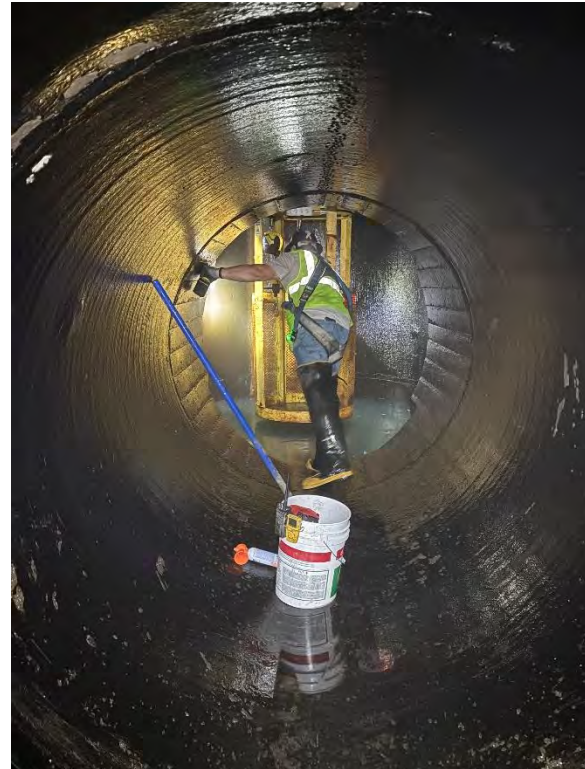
Washington Ave. Shaft and Drift Tunnel (facing shaft)
